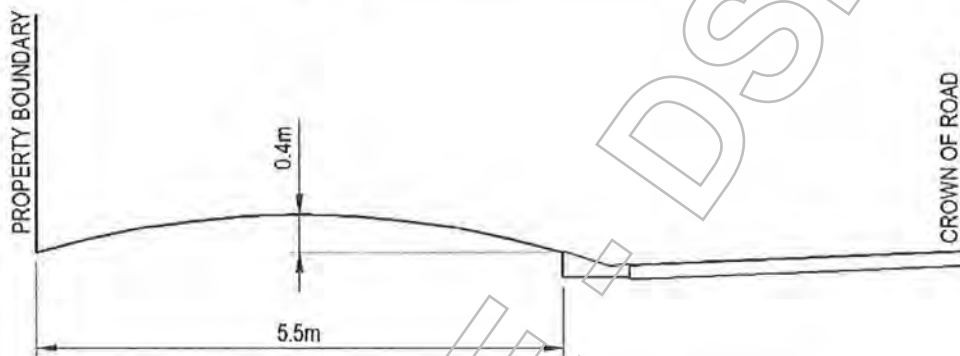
Proposed verge profile at Quintin Street (driveway area)
